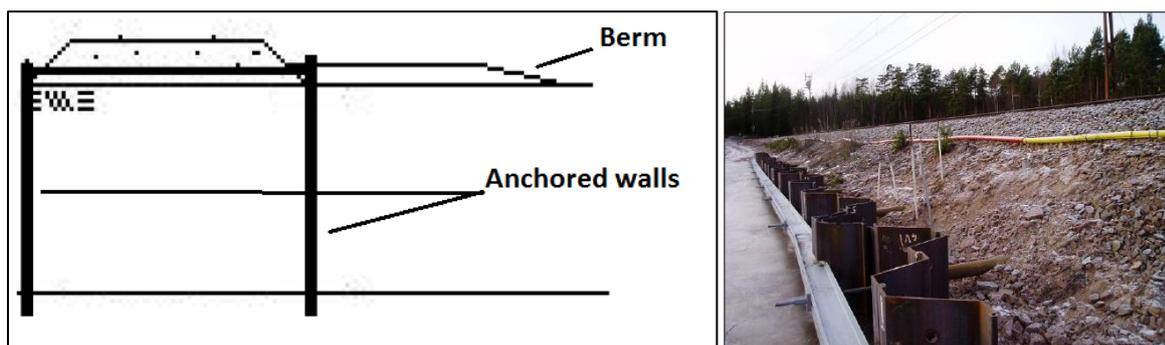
LEFT: SCHEME OF ANCHORED WALLS WITH STABILIZING BERM IN A RAILWAY EMBANKMENT; RIGHT: EXAMPLE IN VITMOSSEN (SWEDEN)
